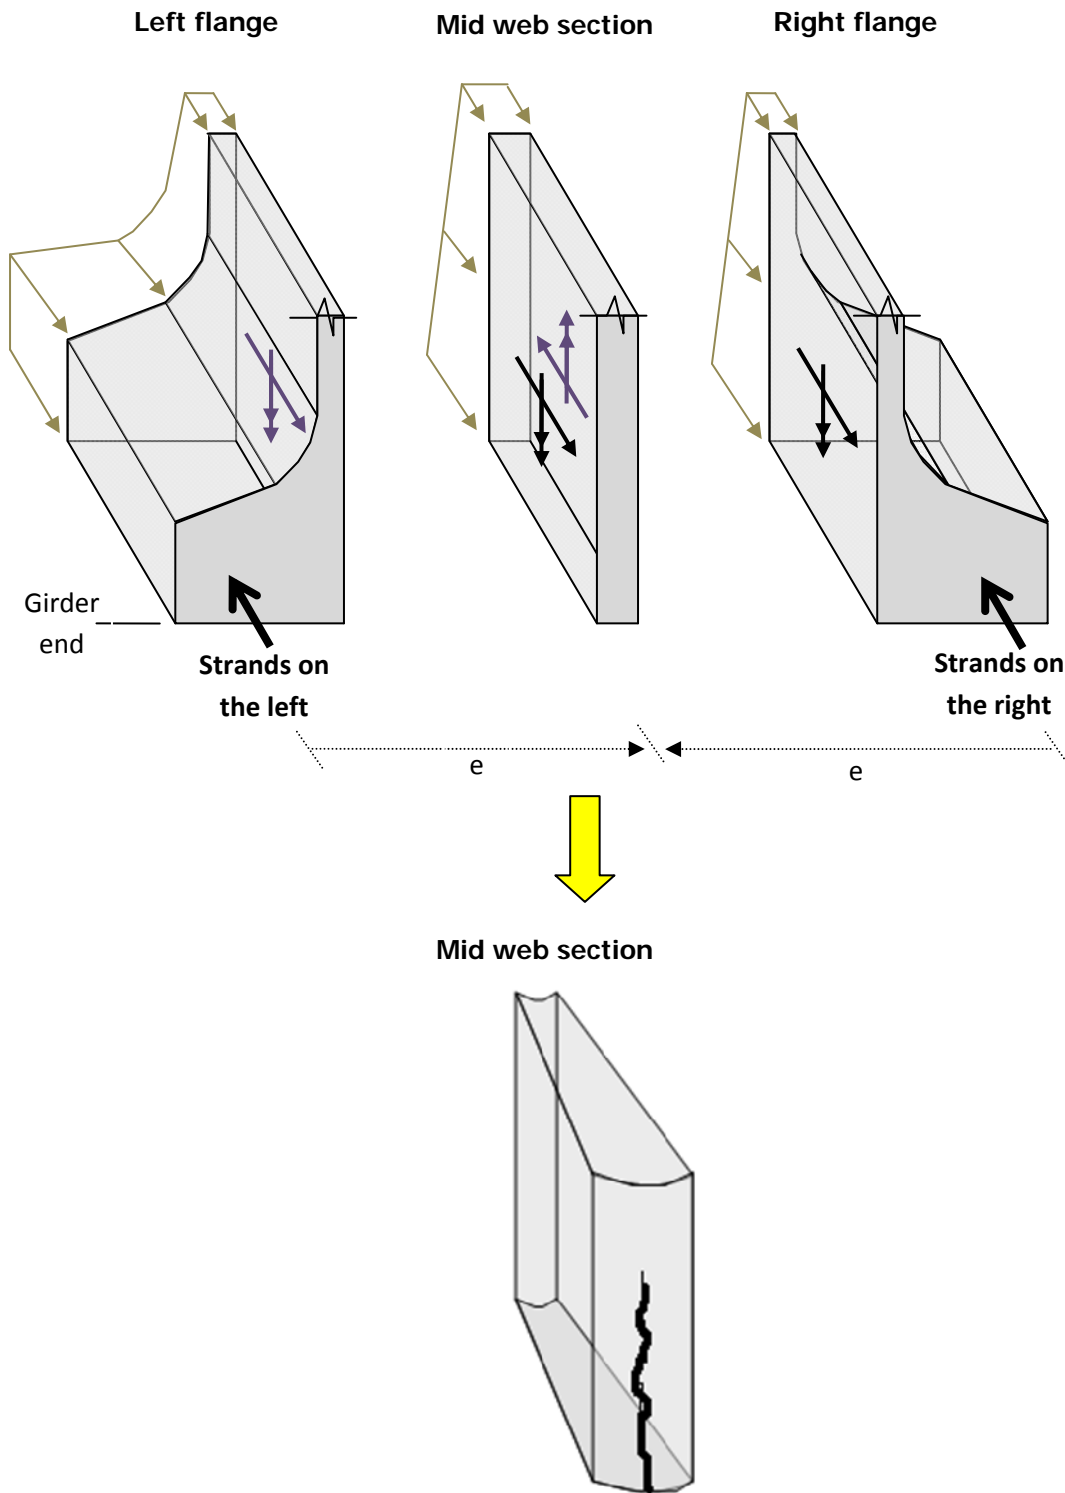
Example free body diagram illustrating bottom flange Y cracking
